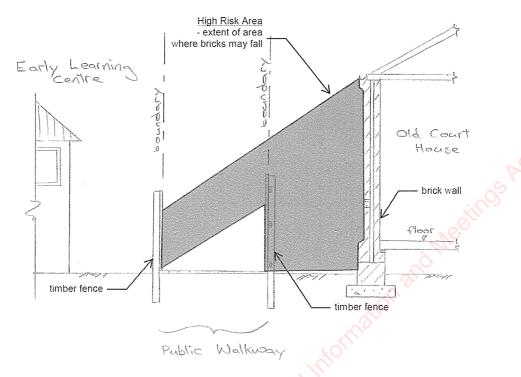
Section through Old Court House west wall showing extent of High Risk Area
